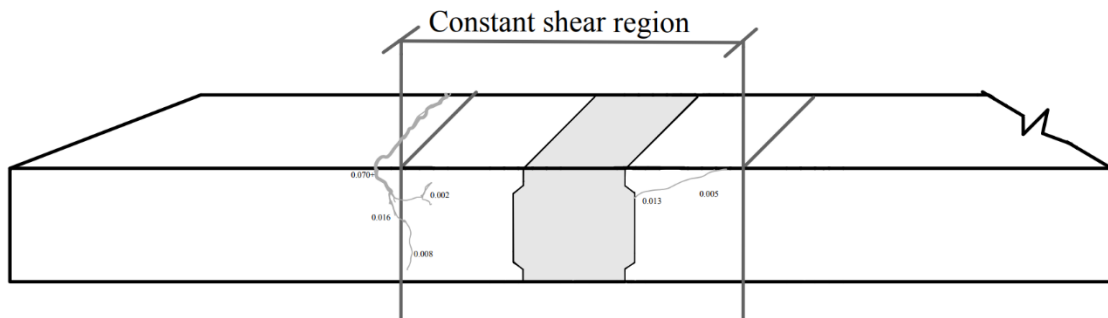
Crack Propagation for Non-Proprietary Short-Term Specimen at 90 % of Final Load
